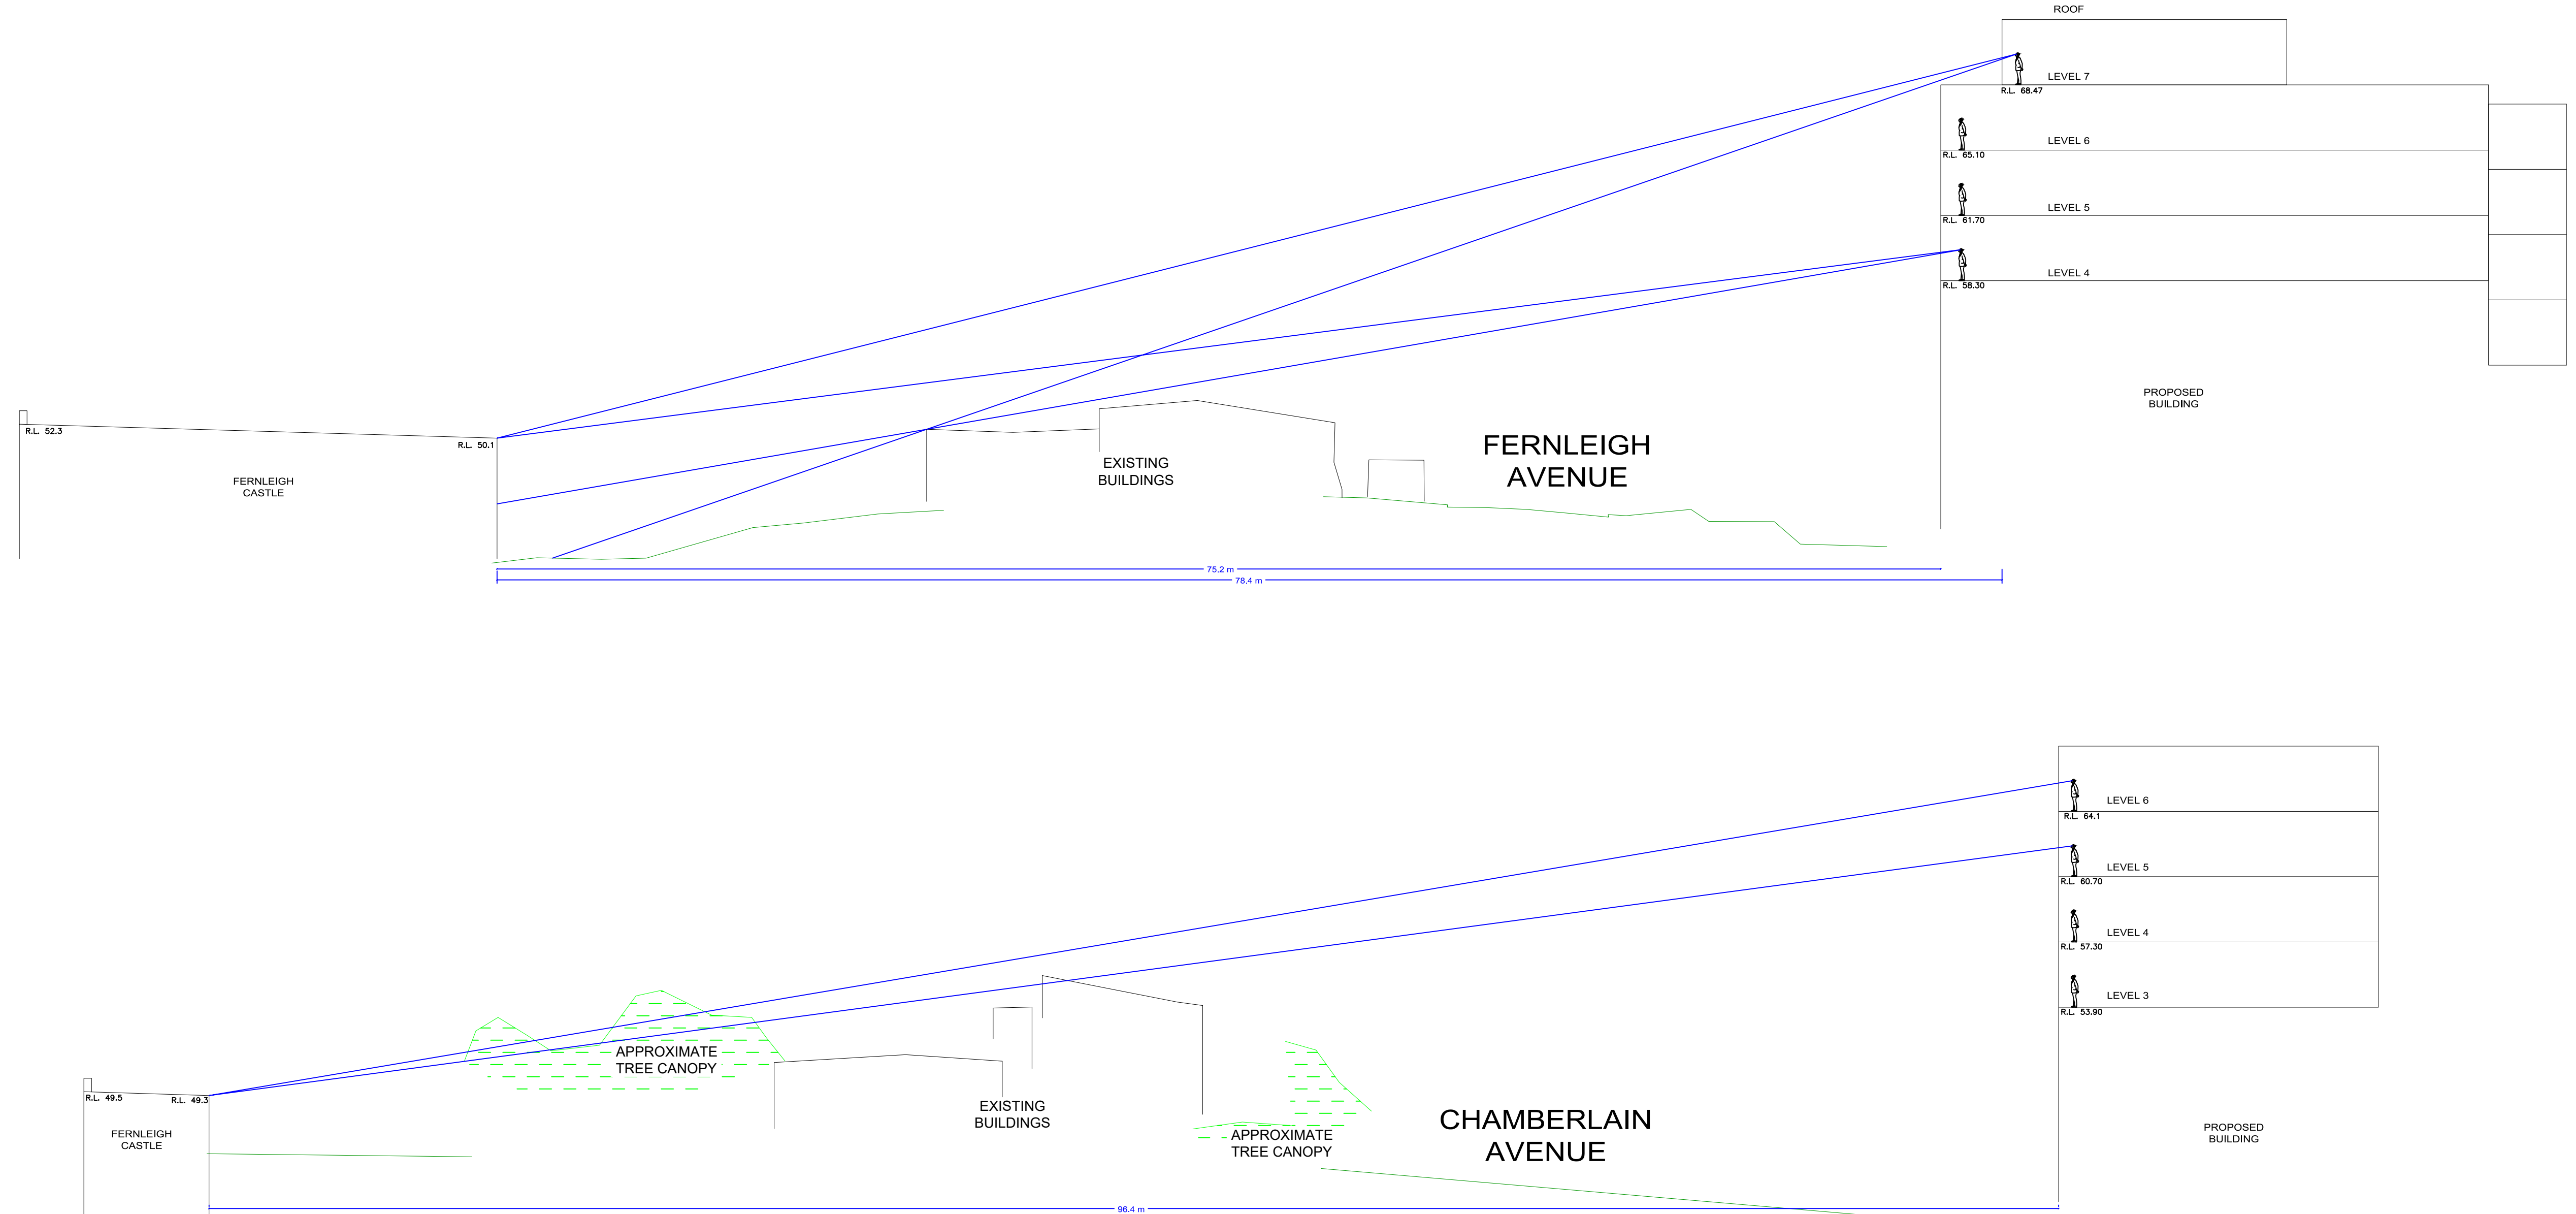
2025	Section - Sight lines from proposed building to Fernleigh Castle (following pages)	Rygate & Company Pty Ltd
